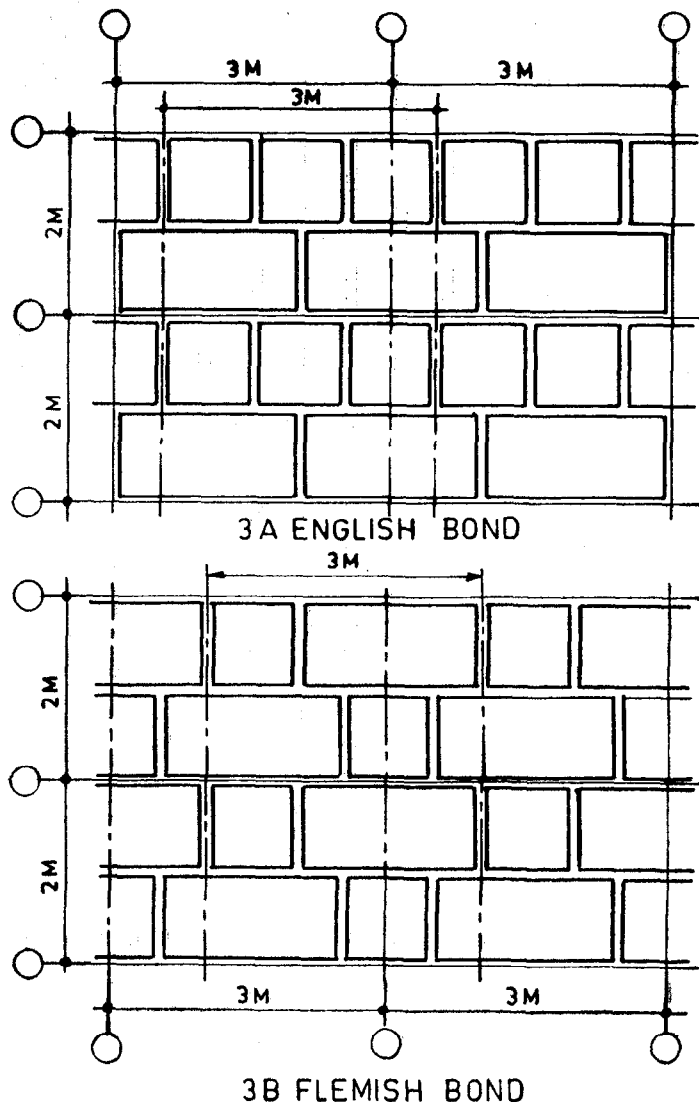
BOND ARRANGEMENT FOR MODULAR BRICKS
